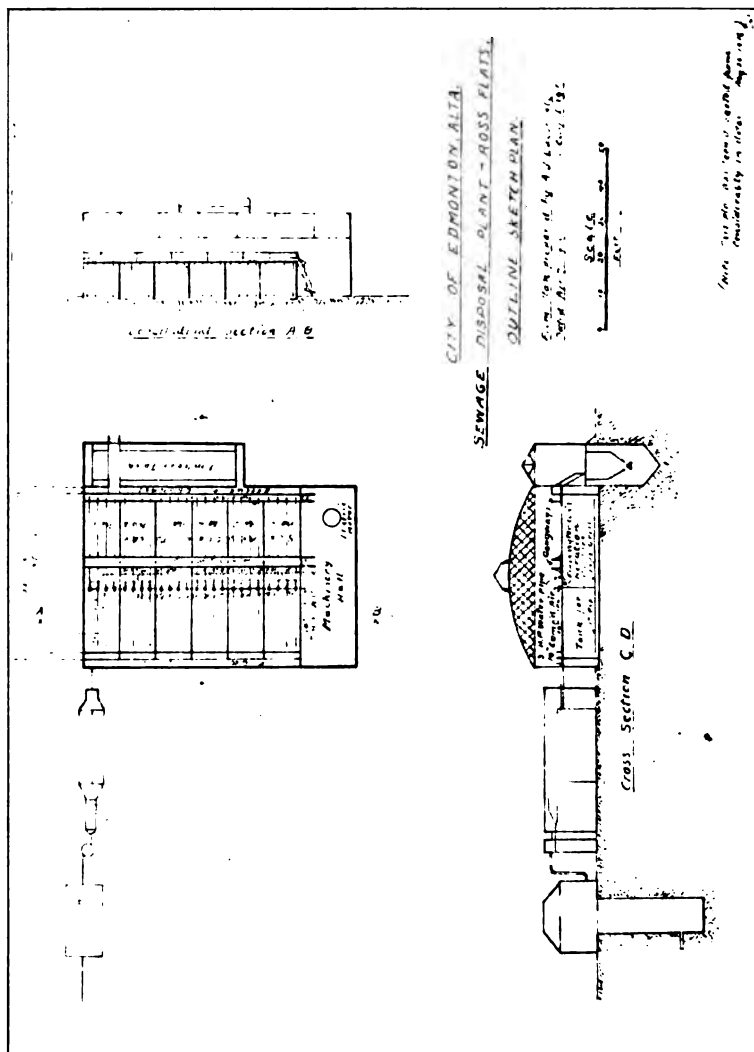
Edmonton, Alberta. Sketch plan of activated sludge plant.
